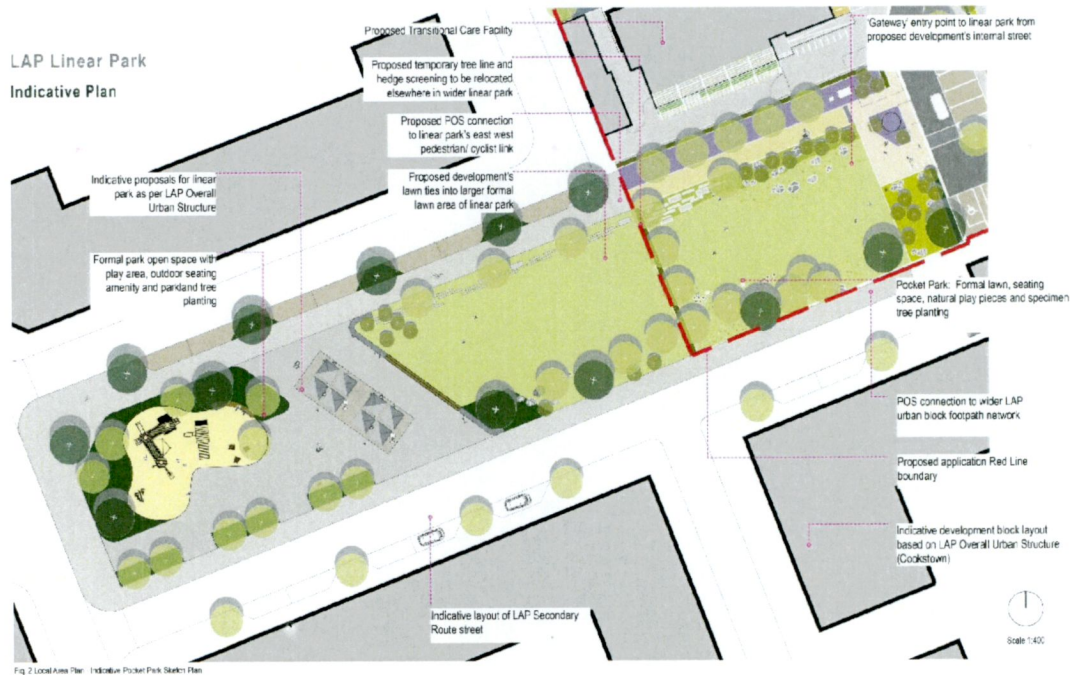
Tallaght Town Centre LAP: Indicative Linear Park Plan
